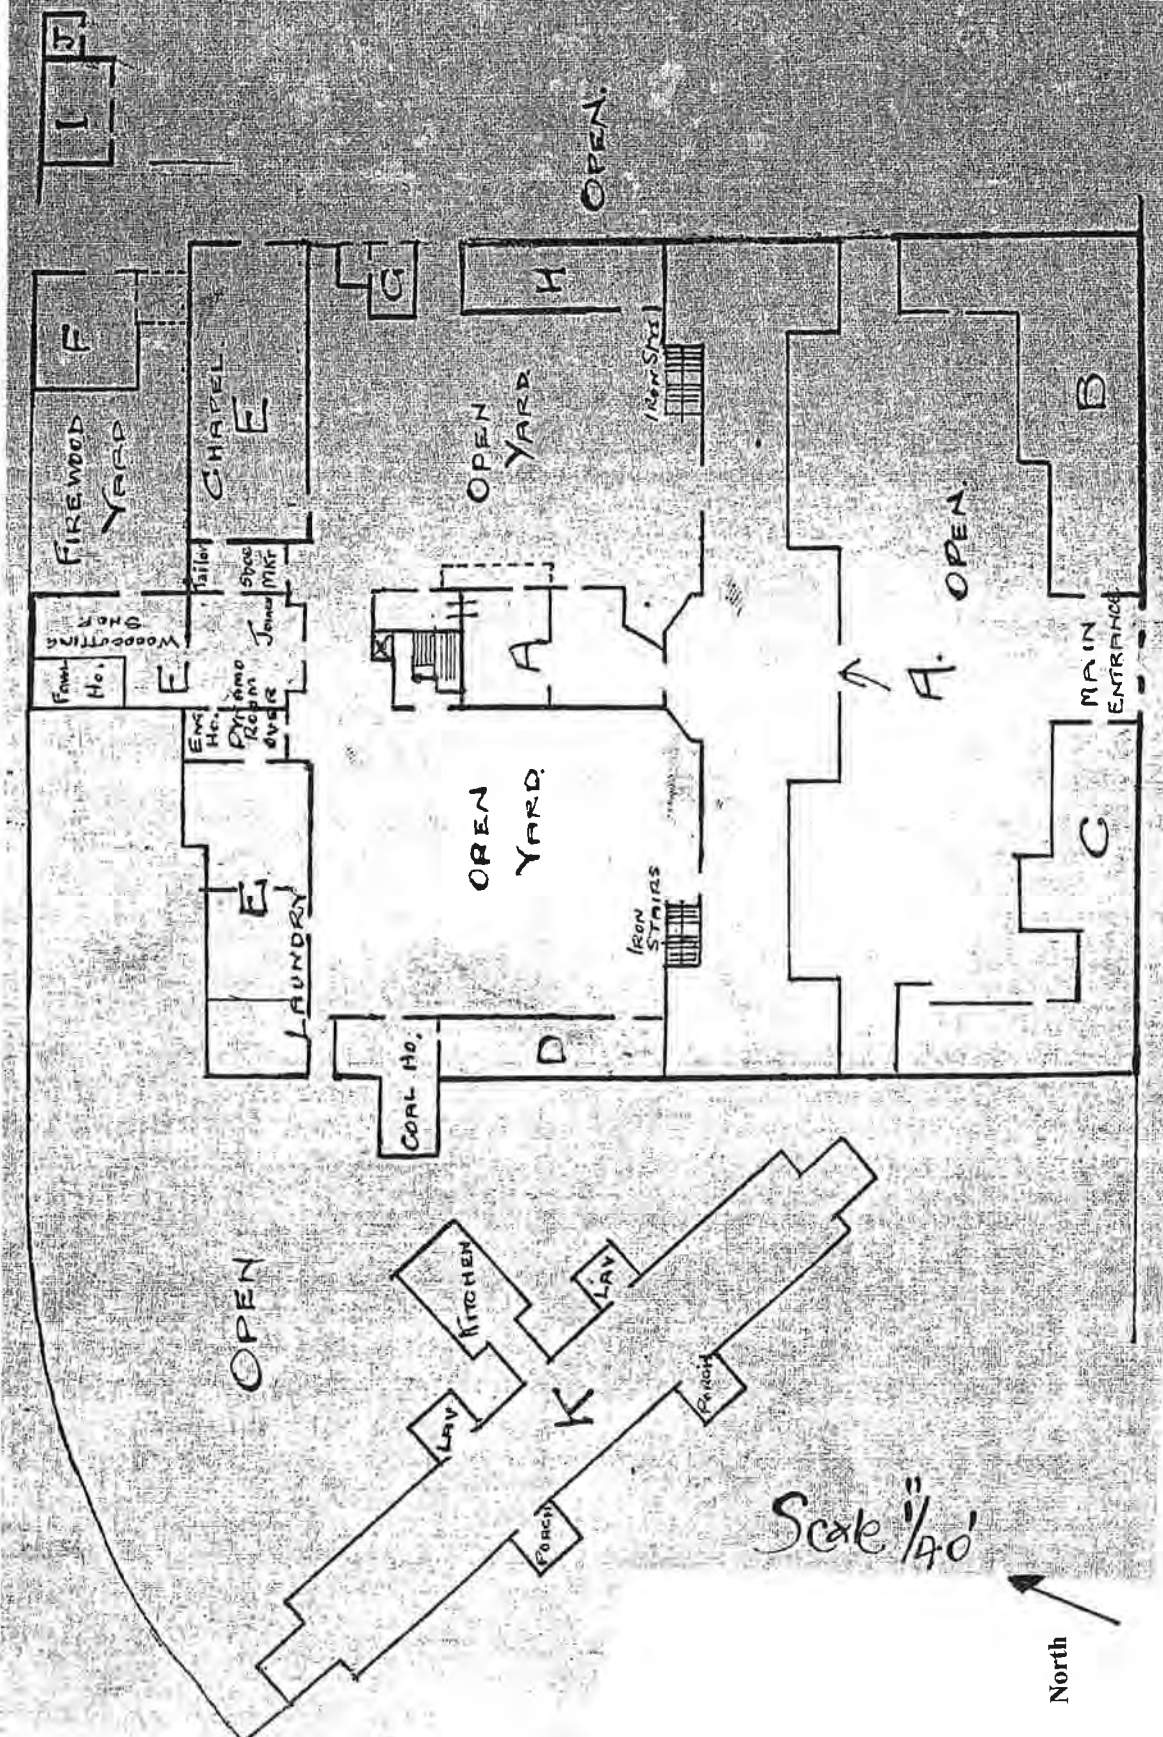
Plan of Bodfan Workhouse c.1881 (XG/2/69)
